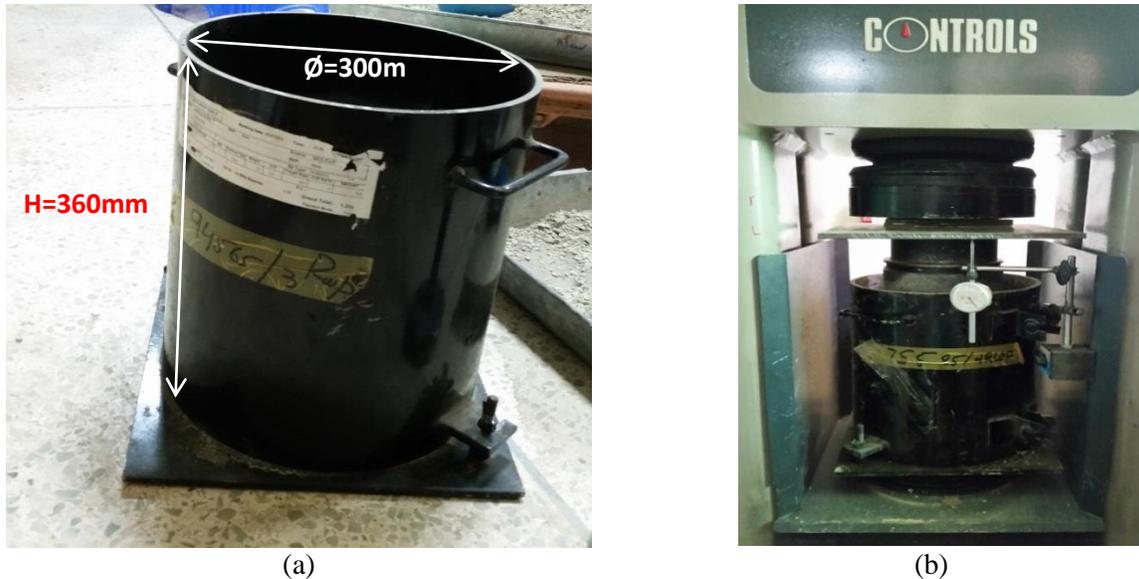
Steel moulds: (a) Dimensions (b) Mould loaded in Compression Testing Machine
